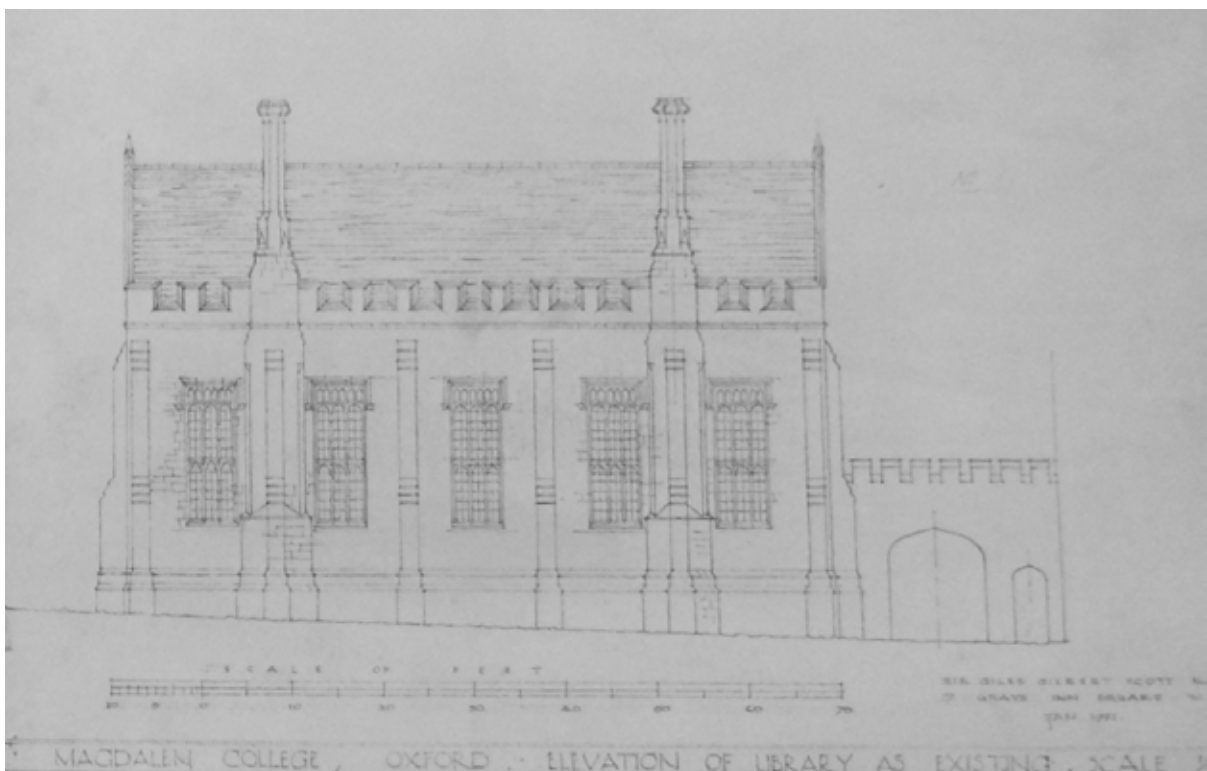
Elevation of Magdalen College Library. Magdalen College Archives.
